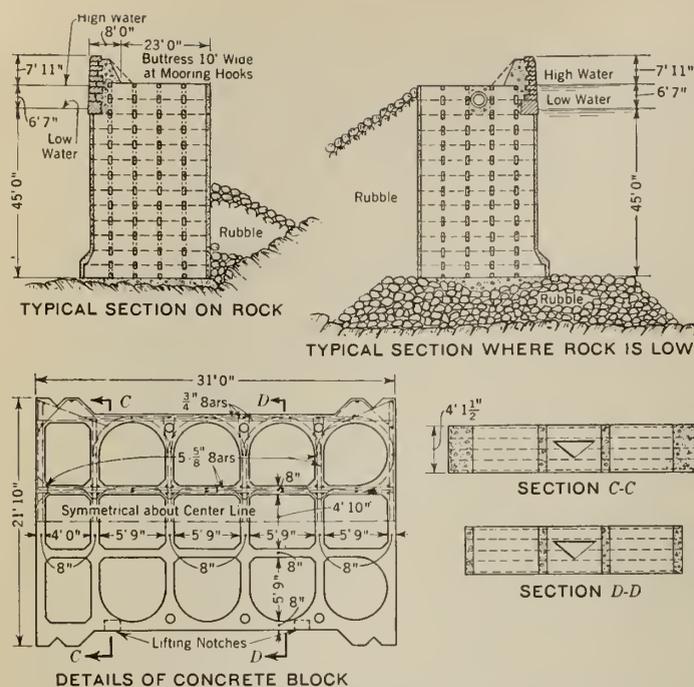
Detail of Dock Wall Construction, Ocean Terminals, Halifax.
